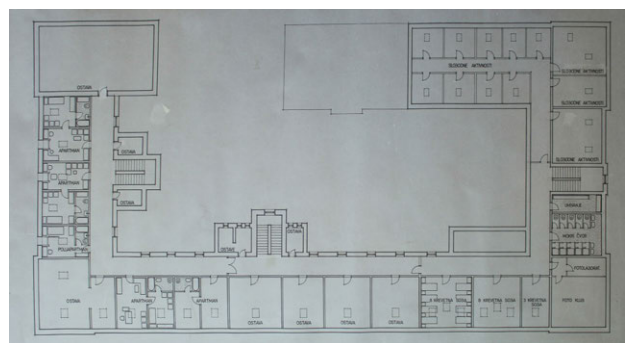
The Convent of Saint Bonaventure, Visoko: attic floor plan, segment of the project for extension and reconstruction done by Vinko Grabovac in 1985 (Archive Visoko)
